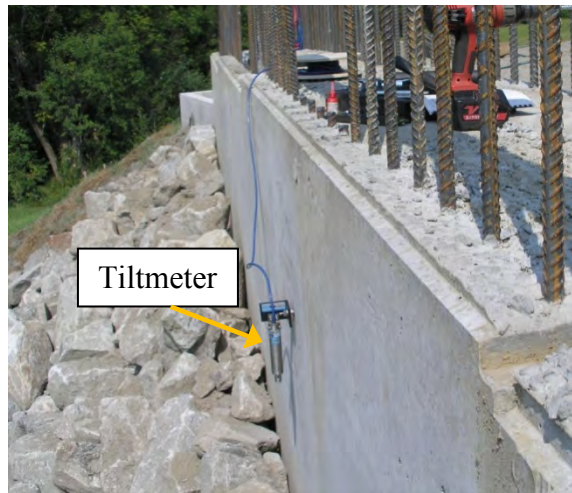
Tiltmeter Location Abutment at East Montpelier Bridge
